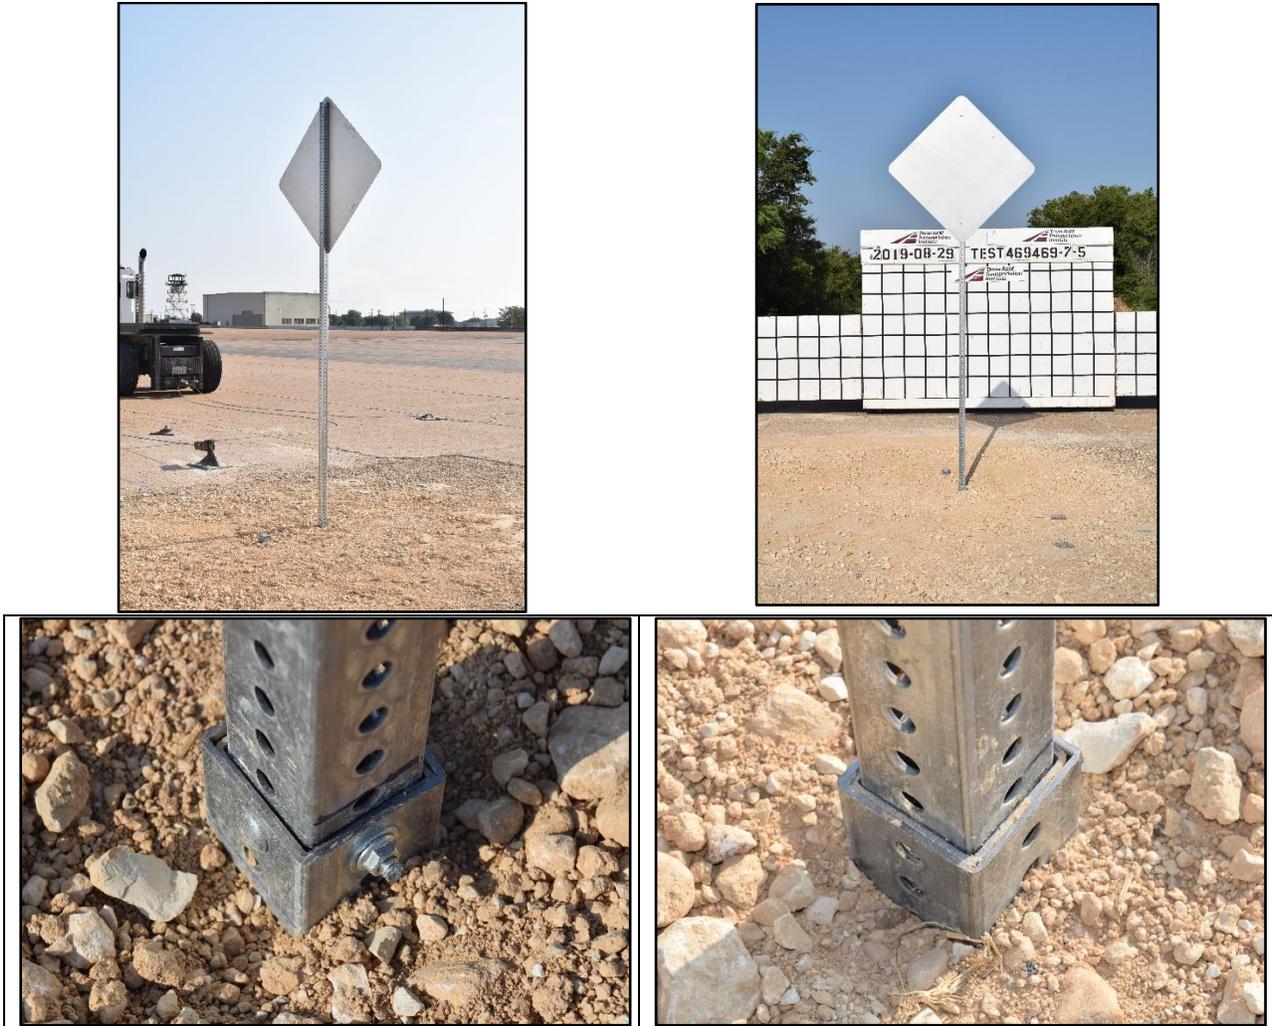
PSST Sign Support in Anchor Stub System prior to Test No. 469469-07-05.
